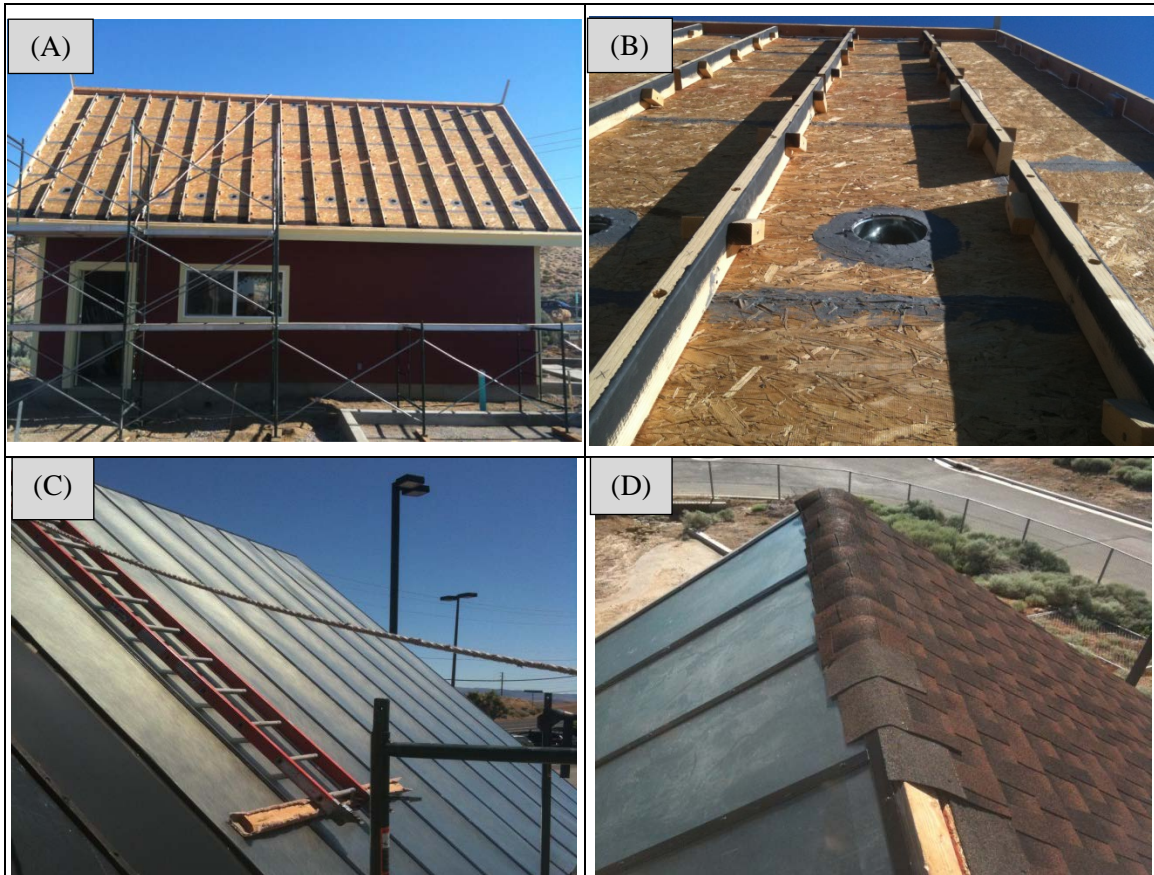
Construction of solar air collector system on roof of REEF Workshop.
